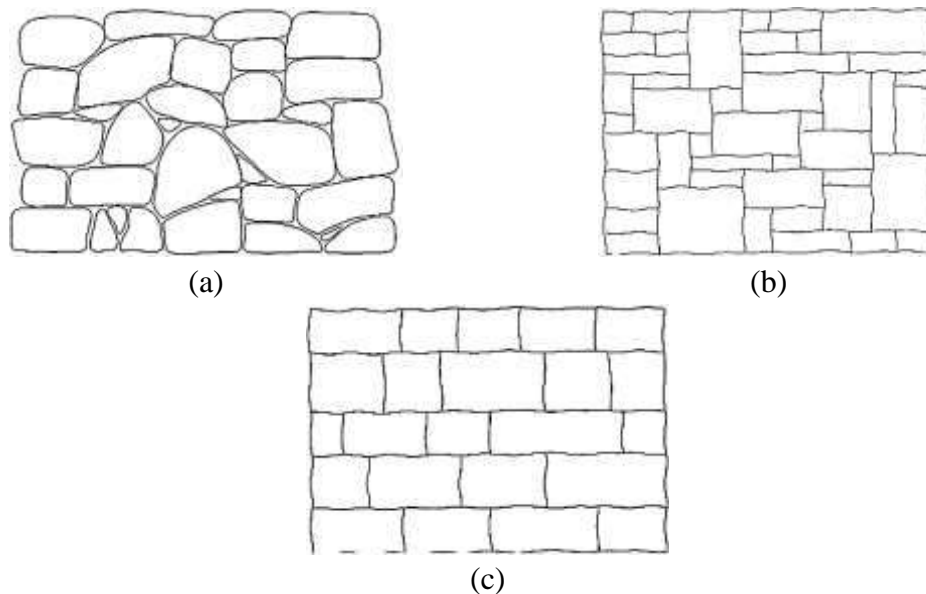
Different types of stone masonry, a) Rubble Masonry, b) Ashlar Masonry, c) Course Ashlar Masonry (Lourenco, 2014)
